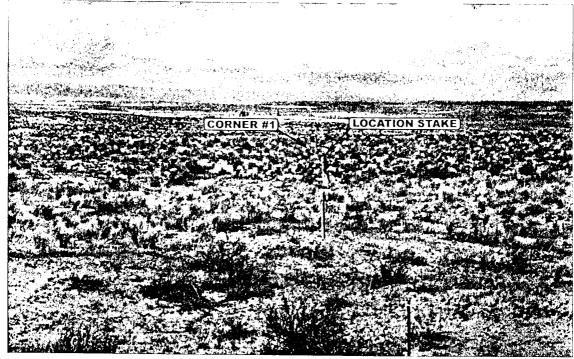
PHOTO: VIEW FROM LOCATION STAKE TO CORNER #1
